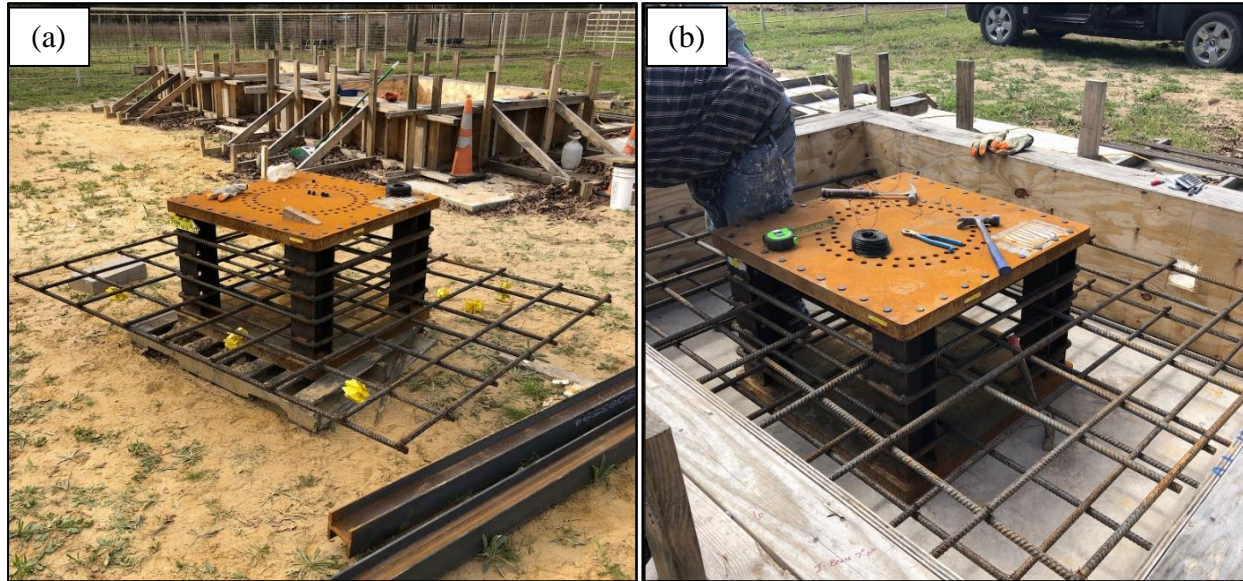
Surface orbital vibrator (SOV) foundation mounting reinforcement. (a) SOV mounting reinforcement being tied in with steel rebar mats; (b) SOV mounting reinforcement with 2 rebar mats placed within the foundation forms.
